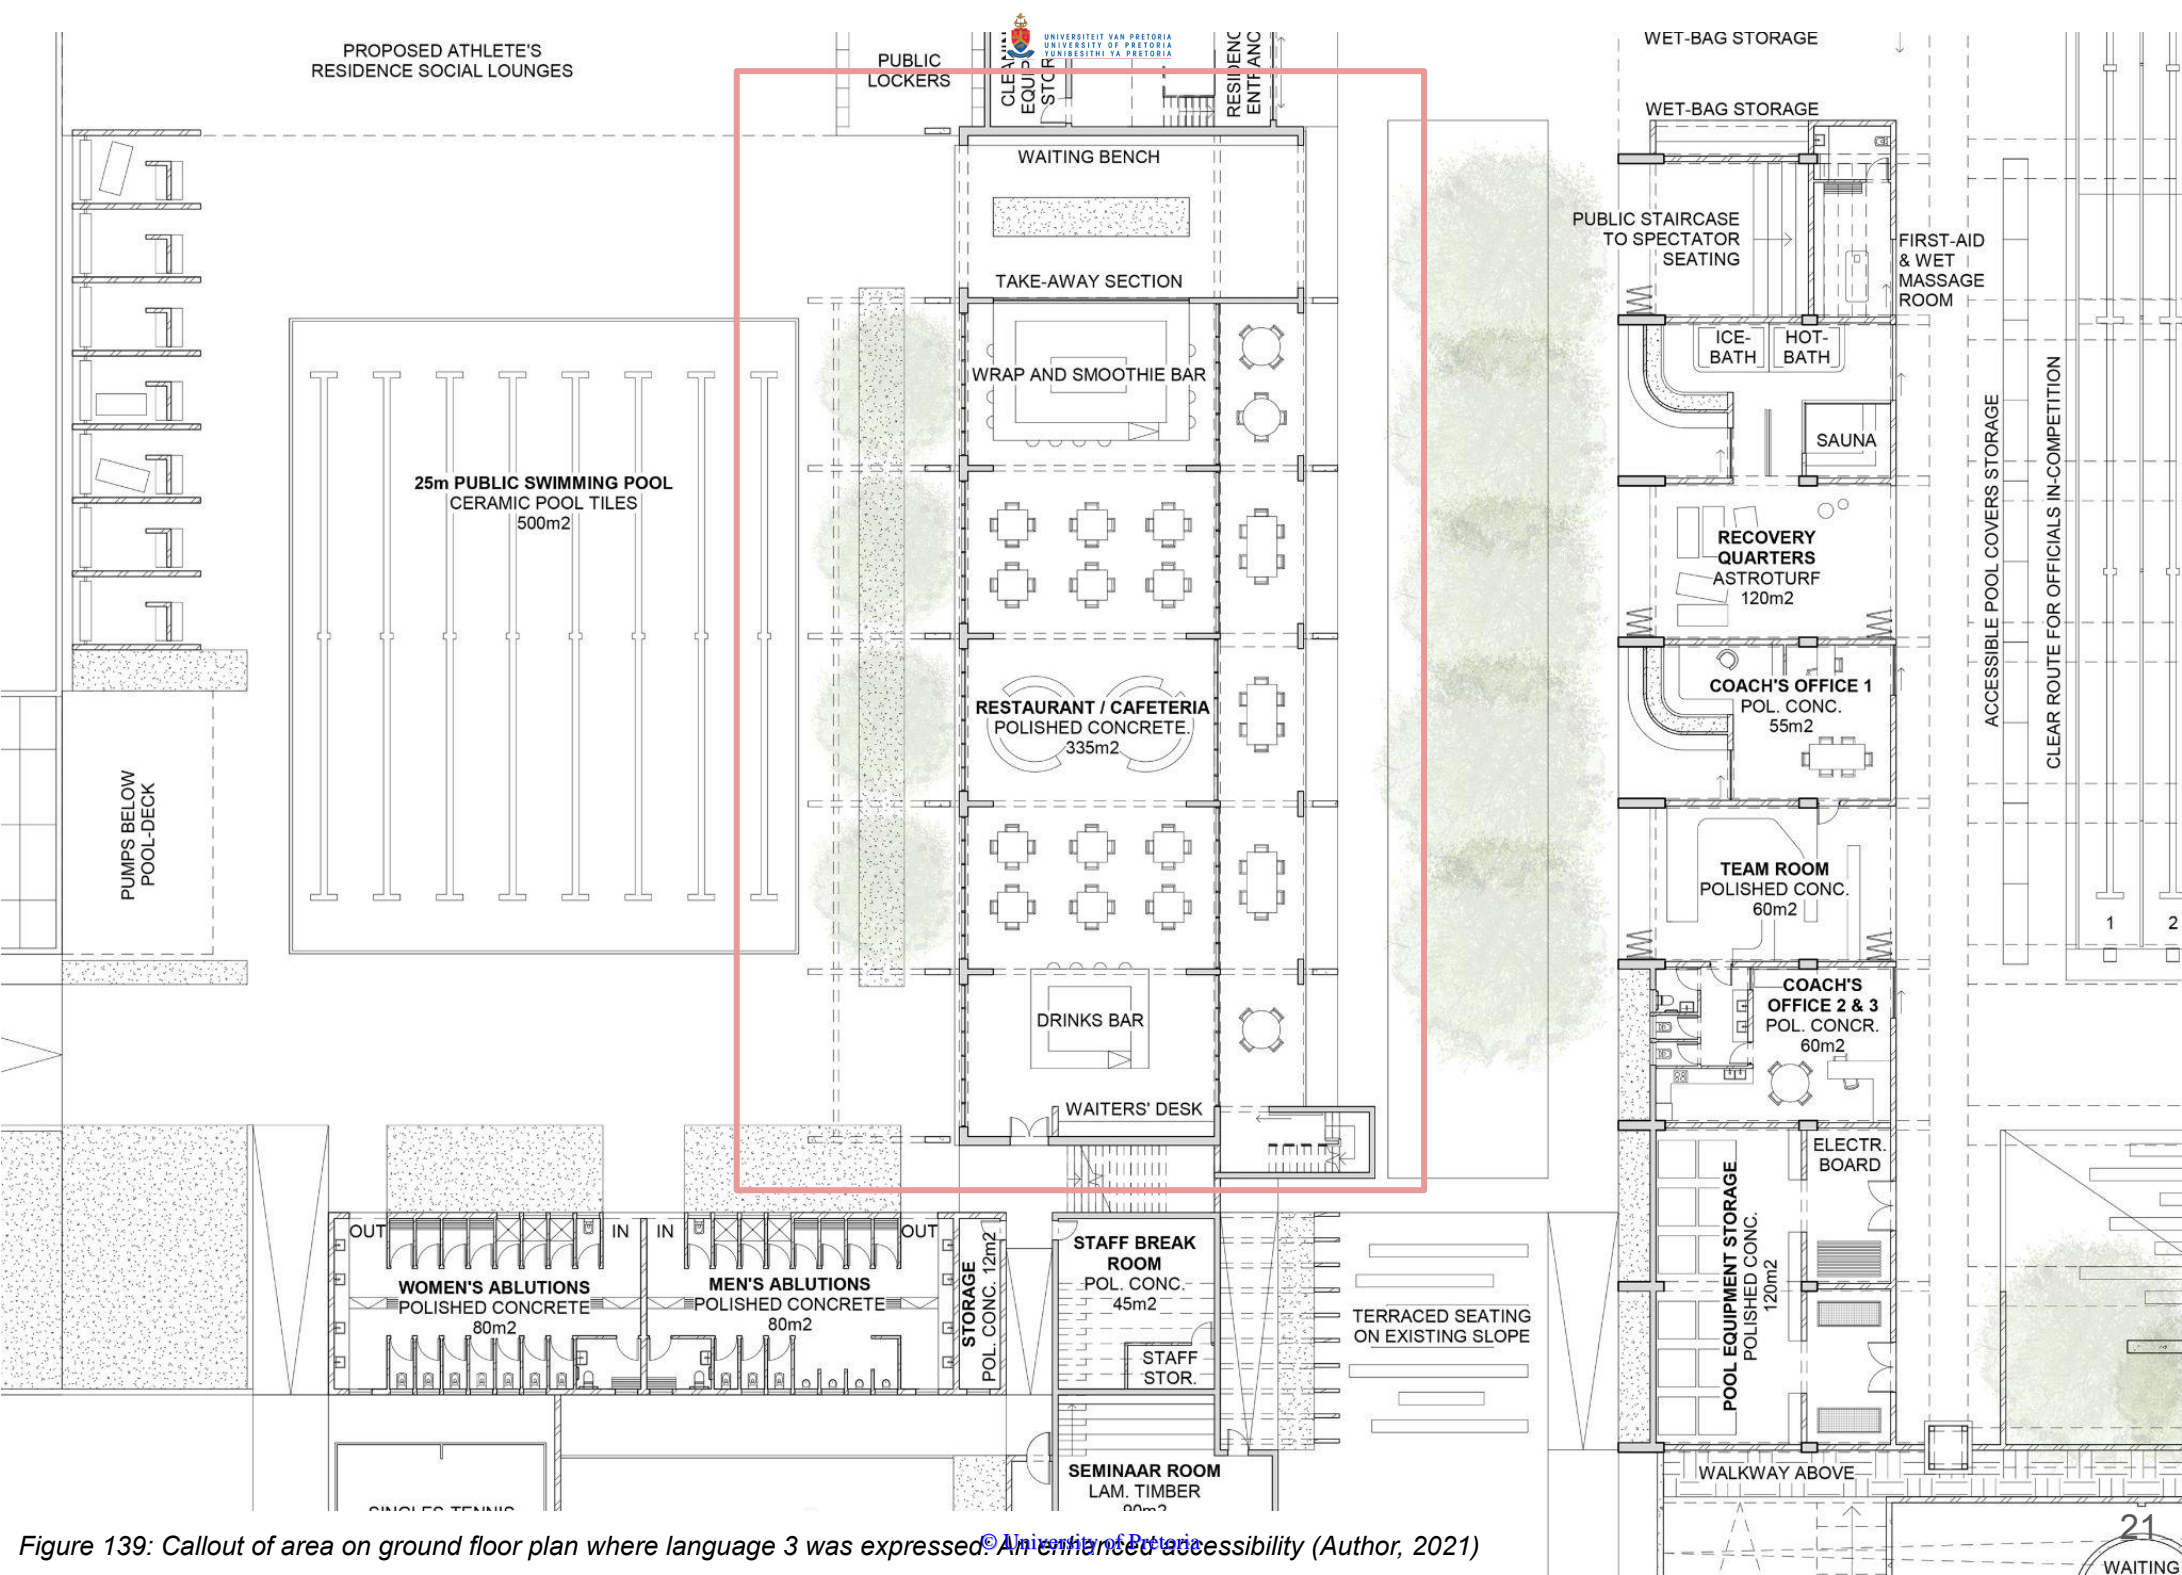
Callout of area on ground floor plan where language 3 was expressed. An enhanced accessibility (Author, 2021)
